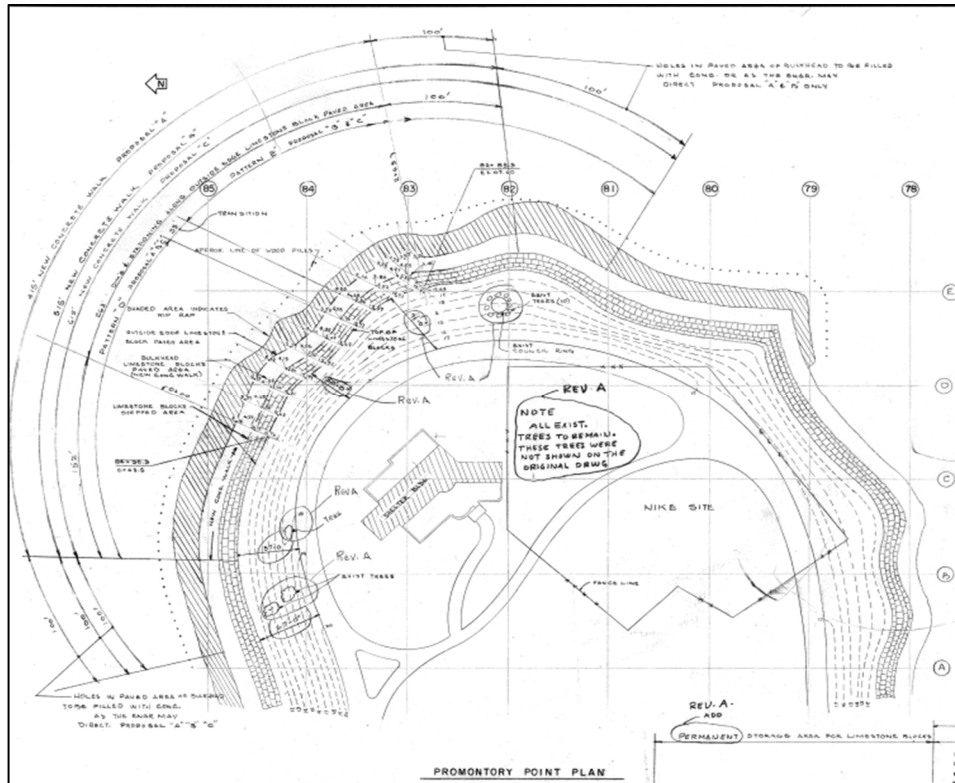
Plan View of 1964 Promontory Point Construction Drawings
